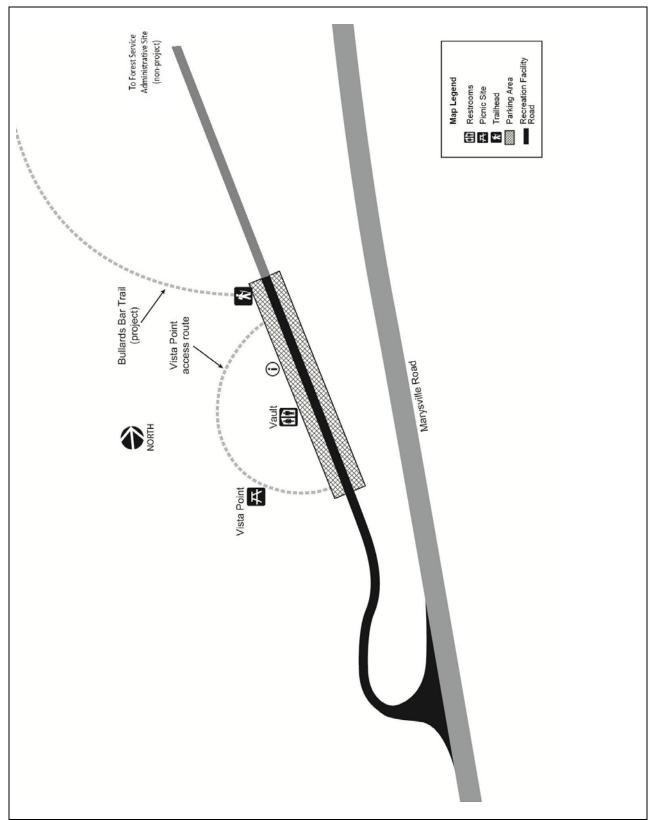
Site plan for the existing Sunset Vista Point facilities.
